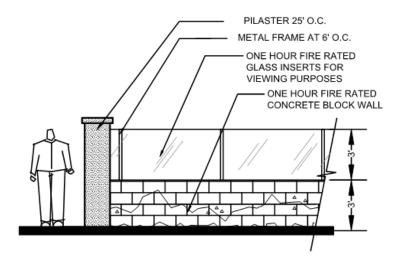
Masonry and Glass View Fence and Radiant Heat Wall
